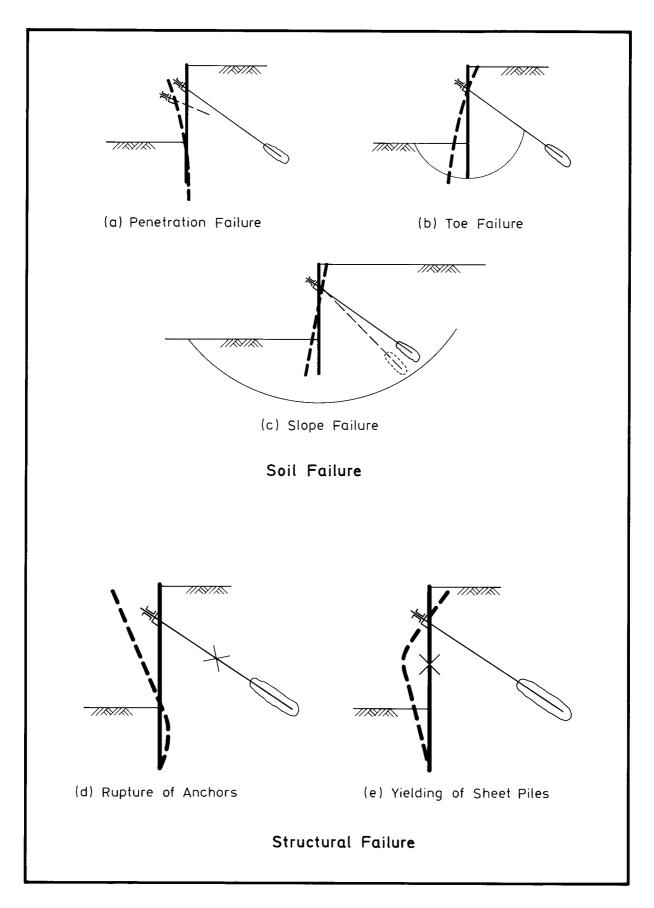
Failure Mechanisms of Anchored Sheet Pile Walls (Broms & Stille, 1976)
